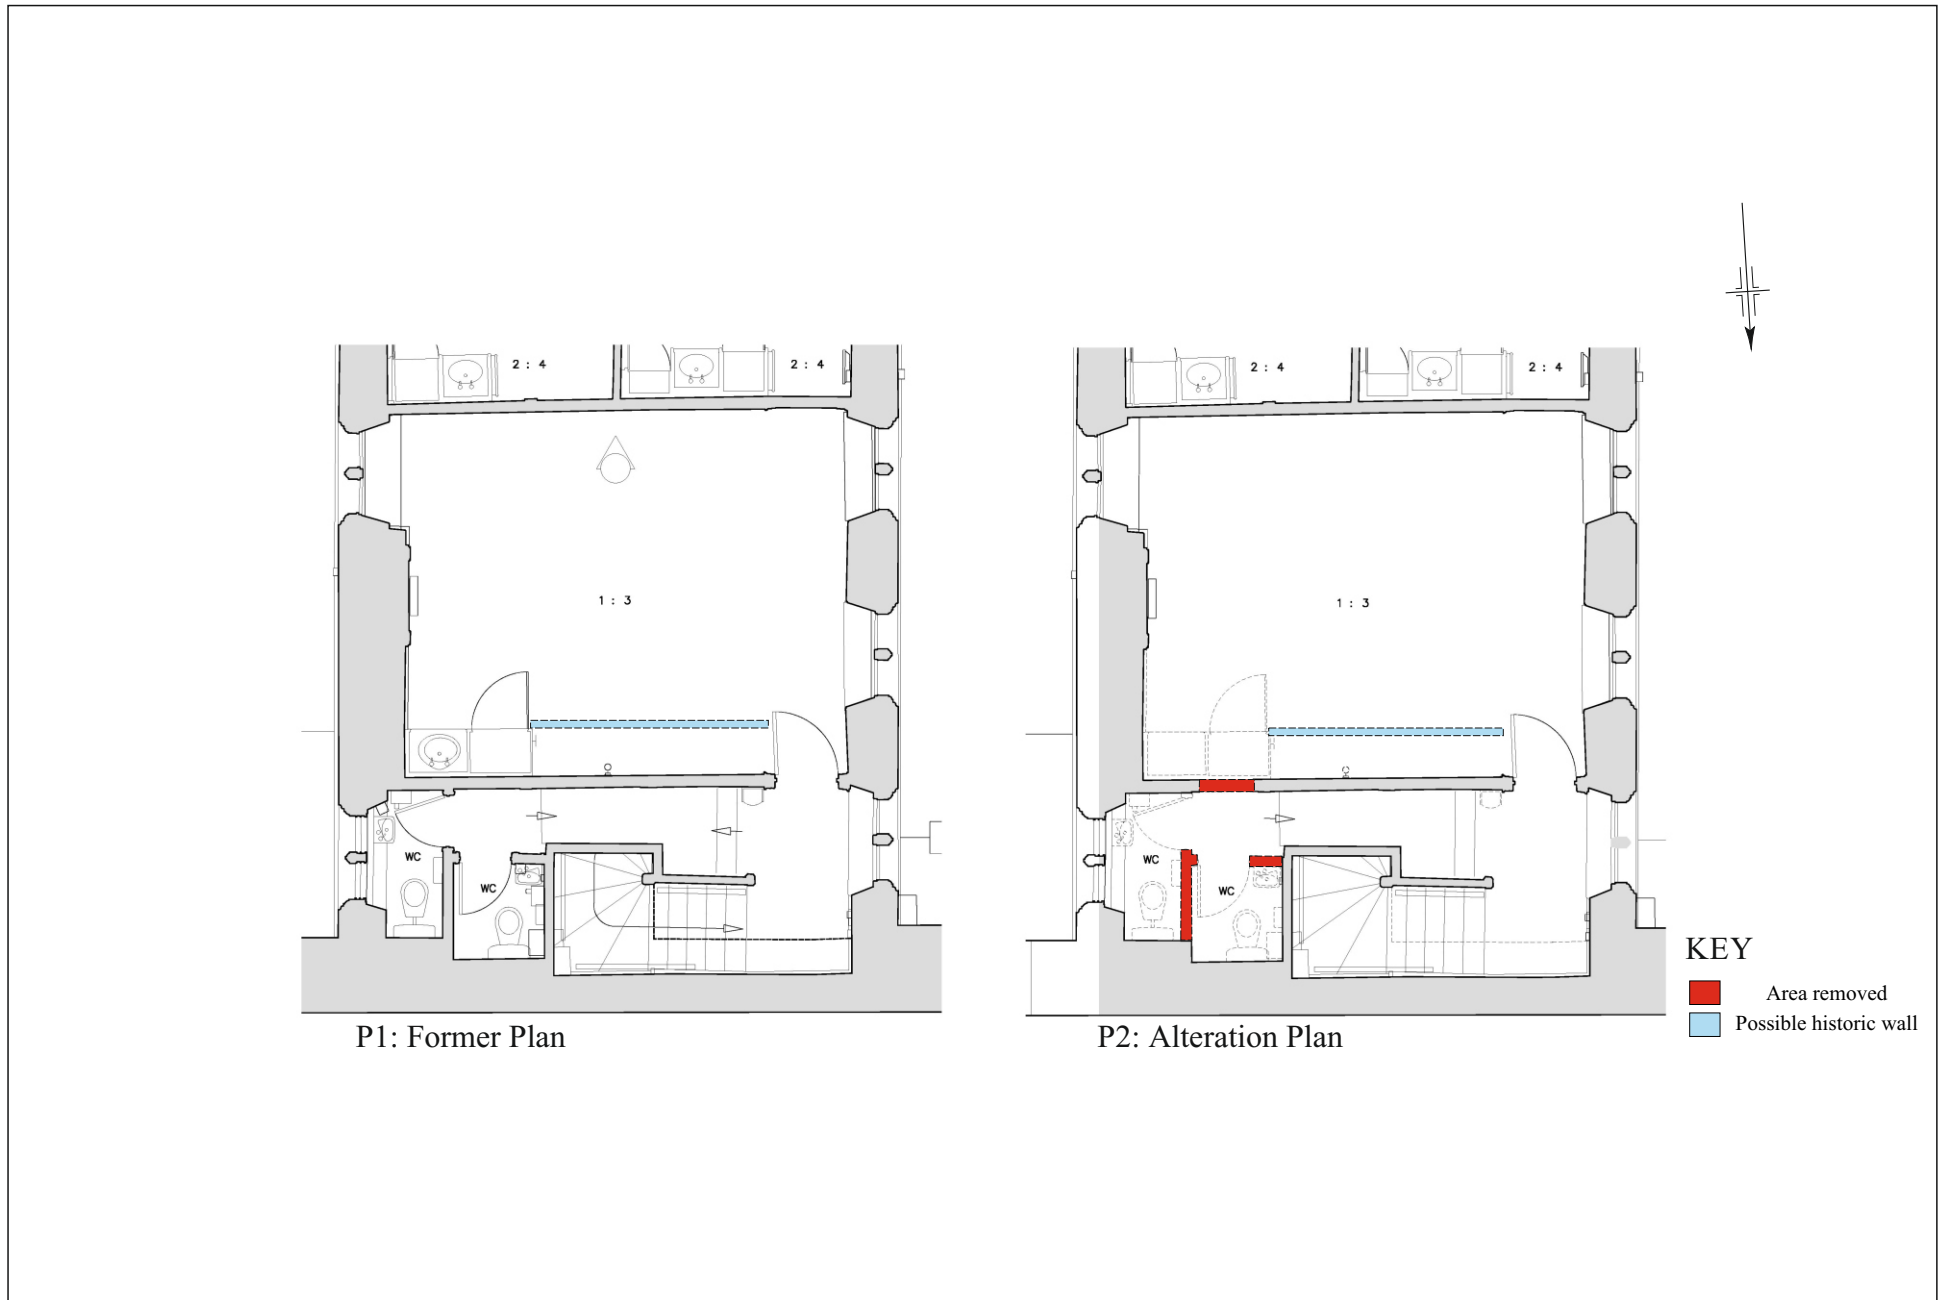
Room 1:3 Former and Alteration Plan of Room 1:3 and bathroom.
